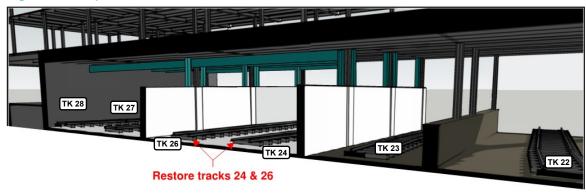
below depicts that, with the strengthening of another section of the tunnel overhead structure, the removal of the columns between Tracks 24 and 26 and the strengthening of the subbasement columns substructure (per Figure 3) could be achieved.
